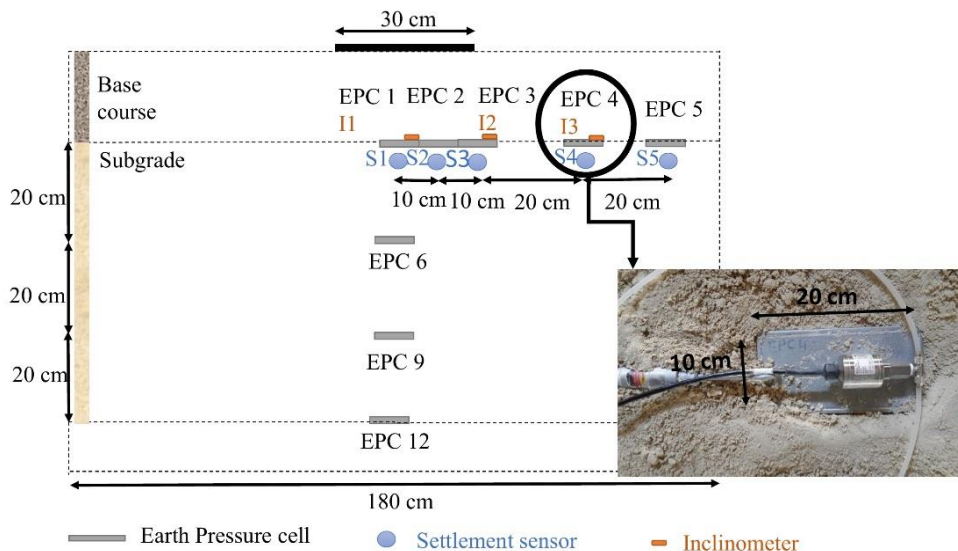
Sensors installation plan for the plate load test, a section.
